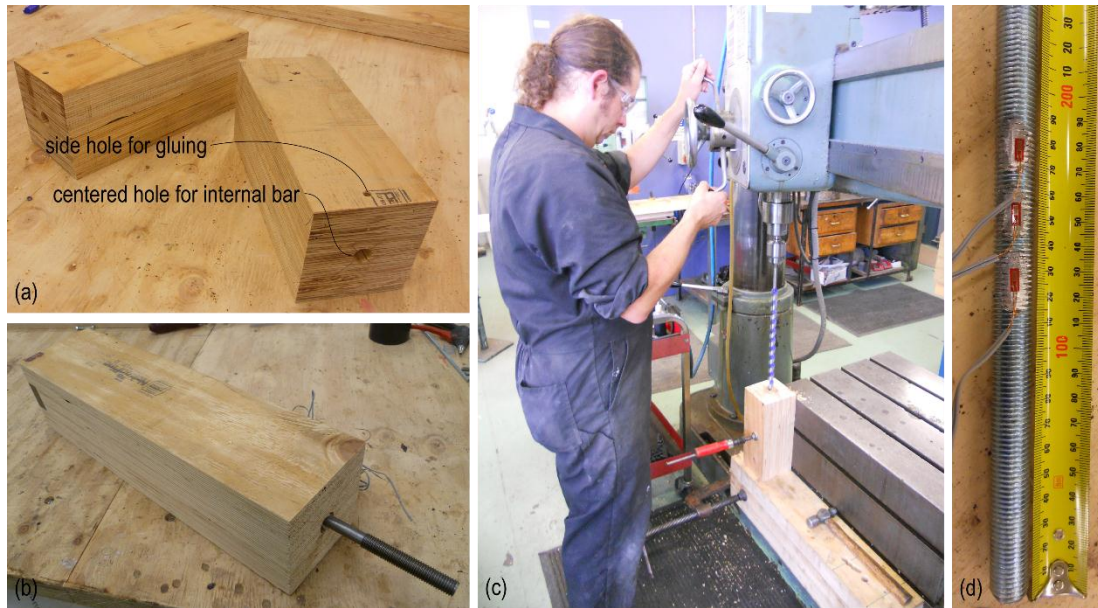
Fabrication of the specimens. (a) Timber blocks; (b) finished specimen; (c) drilling of the timber blocks; (d) strain gauges setup.
